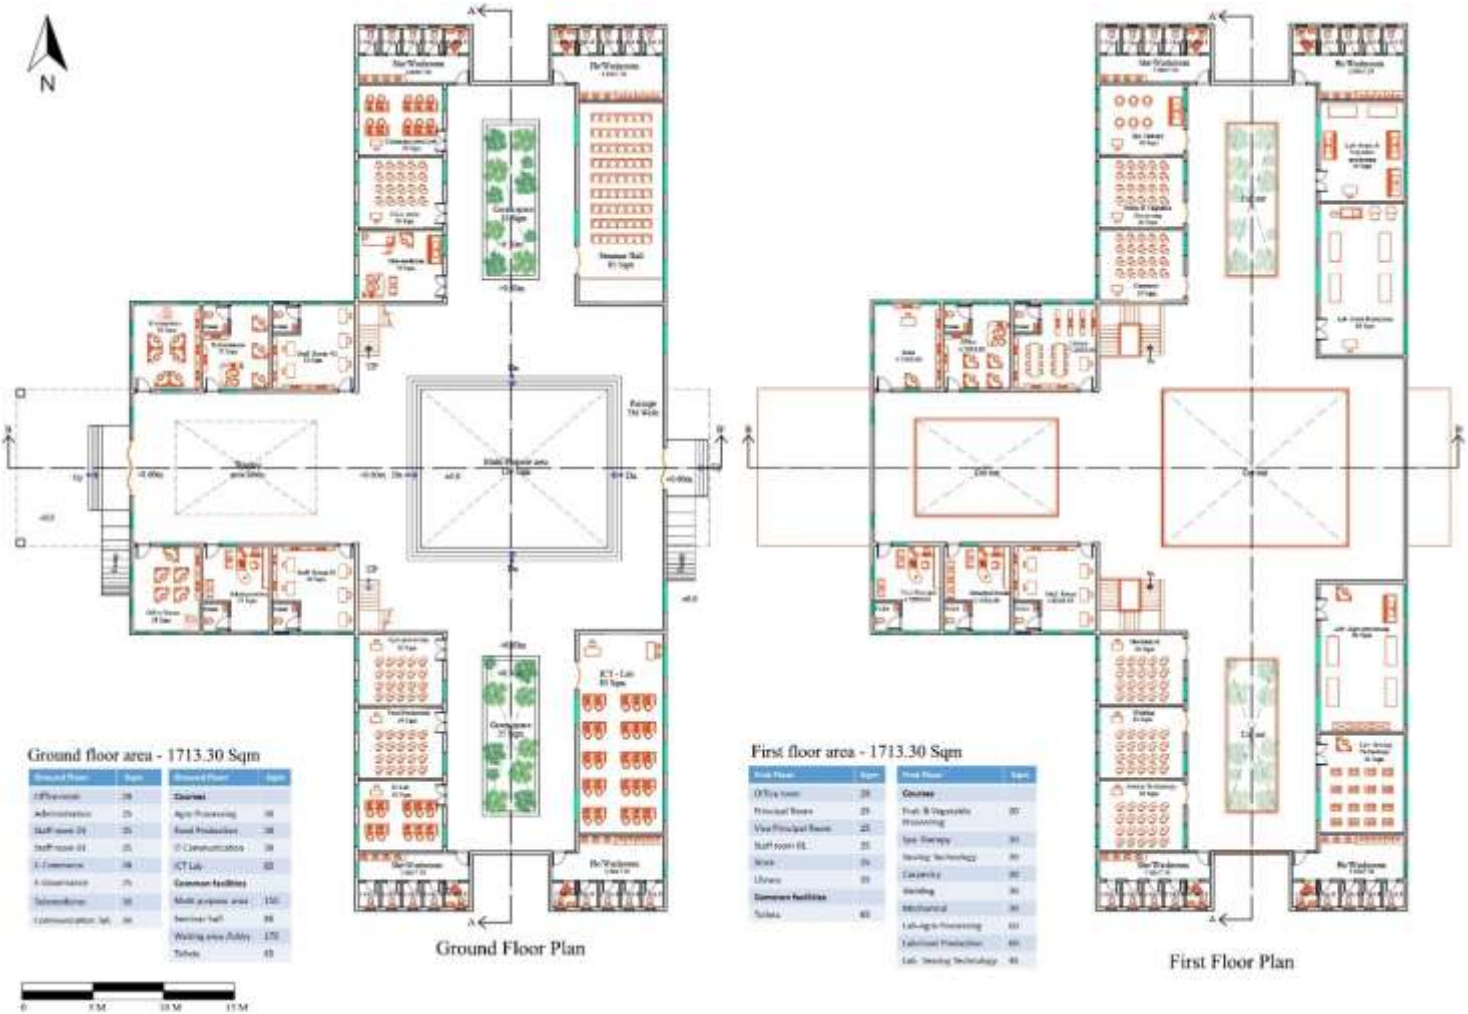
Floor plans of Vocational and Skill Development Centre (Block –A). Source: Author
